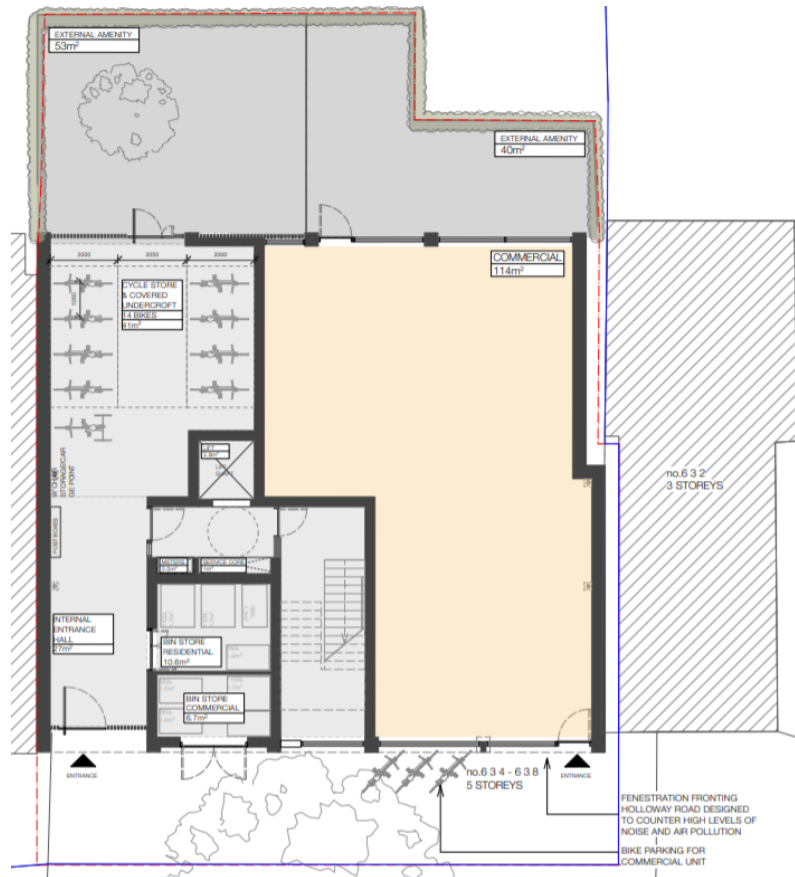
Proposed Ground Floor Plan with Cycle Parking & Refuse Areas
